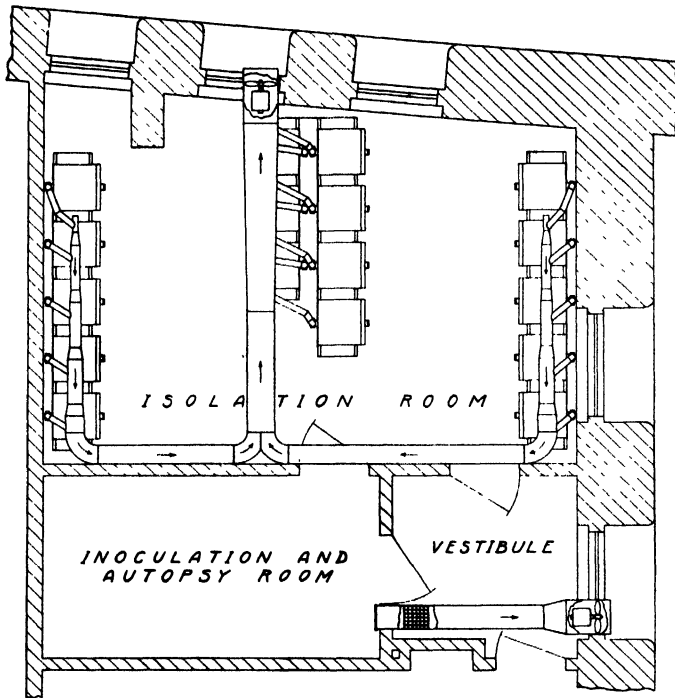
FLOOR PLAN OF ISOLATION UNIT AND DIAGRAM OF VENTILATING SYSTEM
